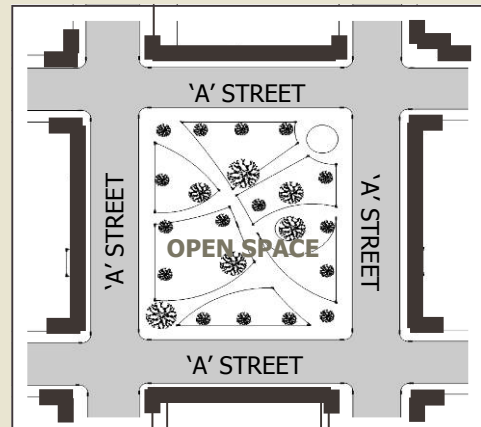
The facades of buildings that address open space will be treated like 'A' frontages, incorporating the highest level of architecture, articulation and use of materials.
